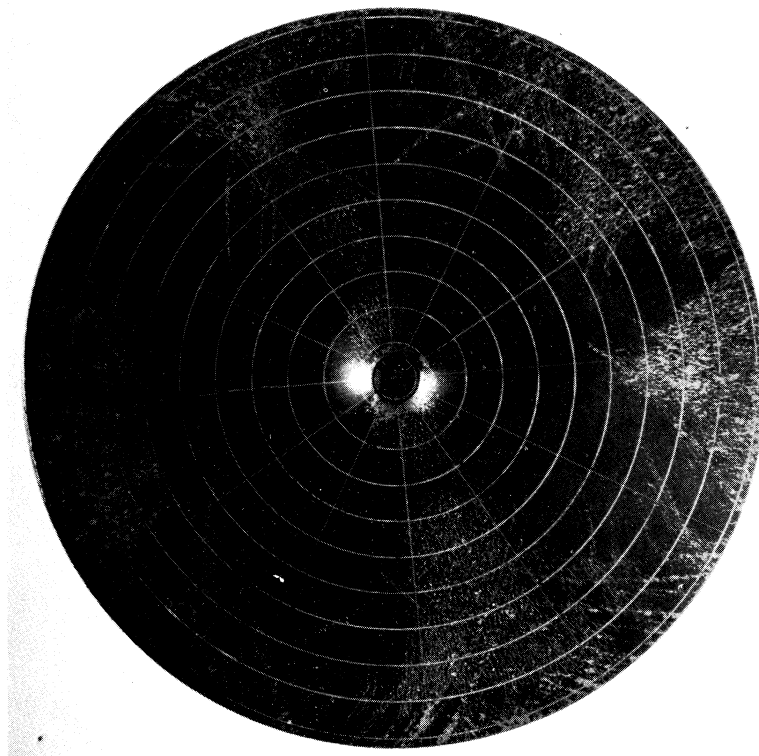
Type-II plate showing crack pattern in mill scale.
